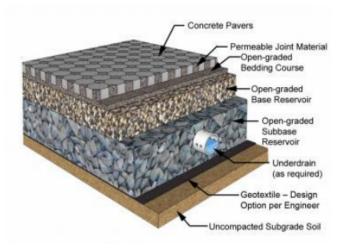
Typical cross section of a permeable interlocking concrete paver system (Smith 2011).
